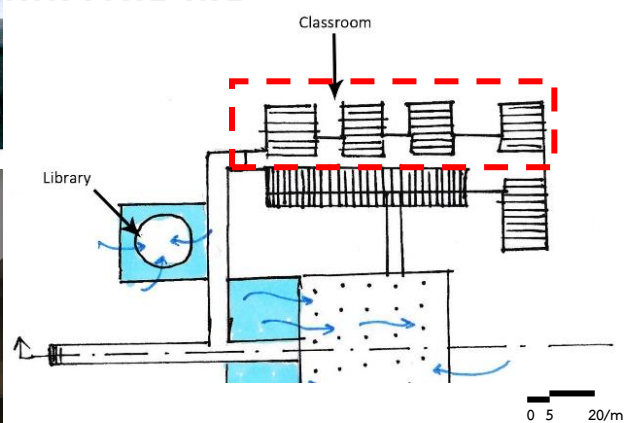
40 The west side classrooms with sidewalls illuminating the natural light, thus preventing external distractions
